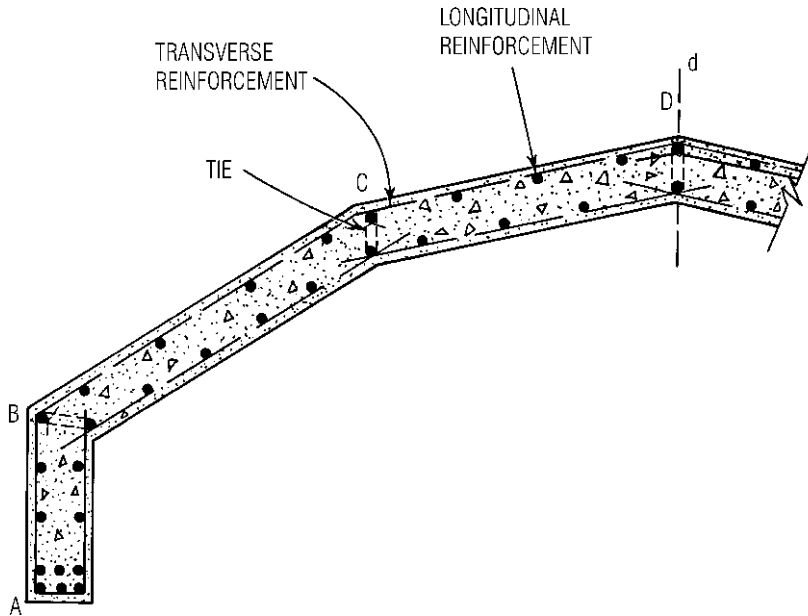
Typical reinforcement at a section of a folded plate.
